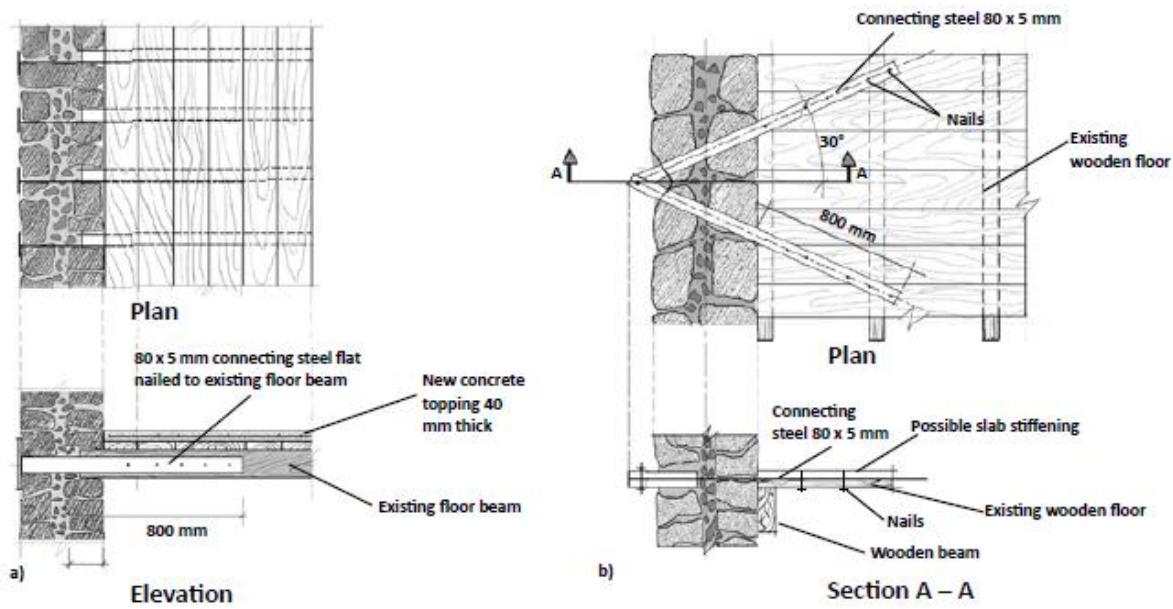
Steel straps for wall-to-floor anchorage: a) floor beams perpendicular to the wall, and b) floor beams parallel to the wall (source: UNIDO 1983)
